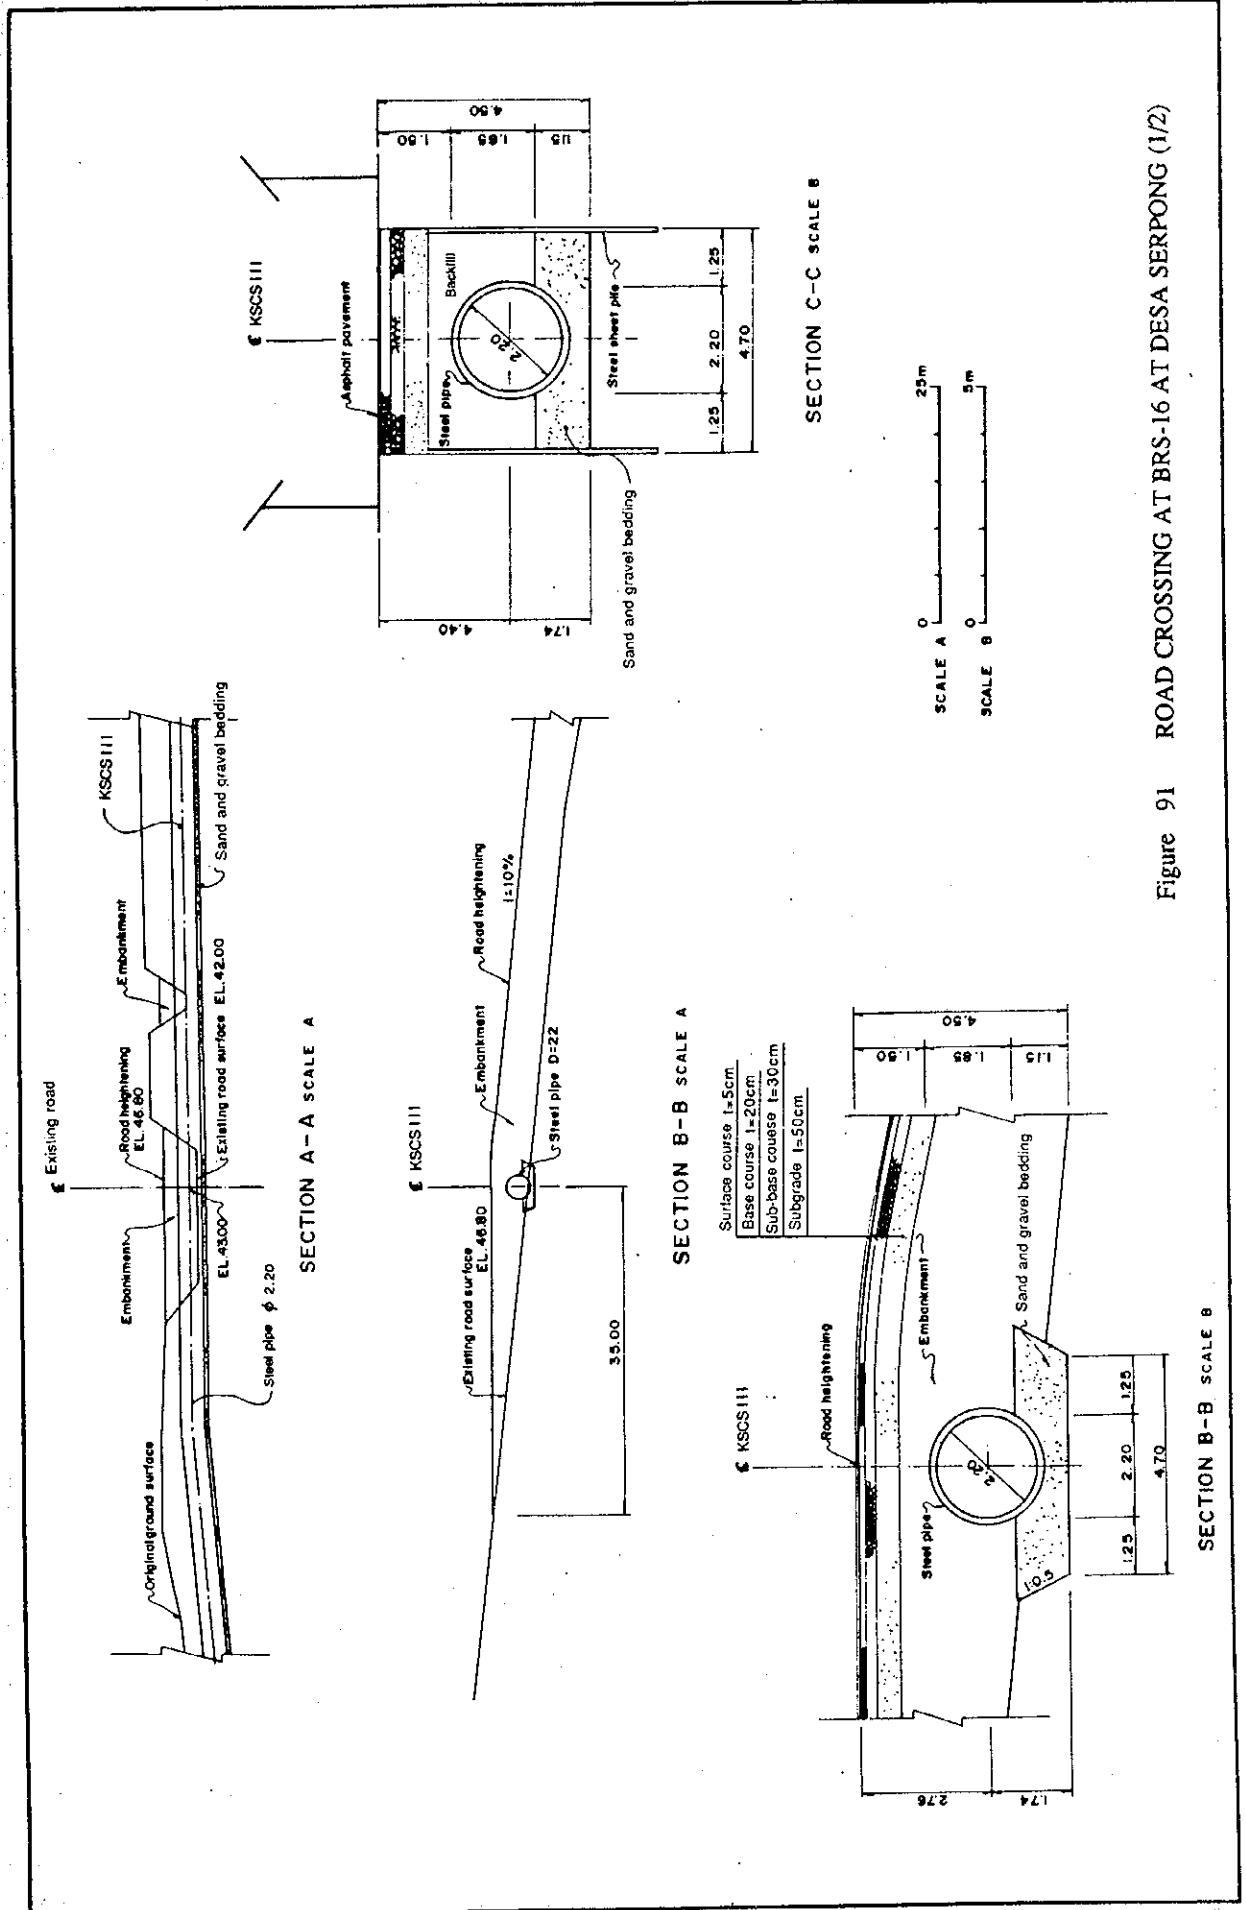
ROAD CROSSING AT BRS-16 AT DESA SERPONG (1/2)
